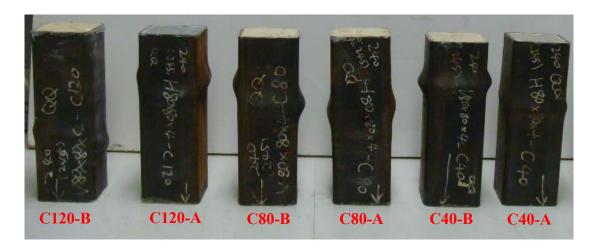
Failure modes of stub columns (series 80×80×4-A and 80×80×4-B)
